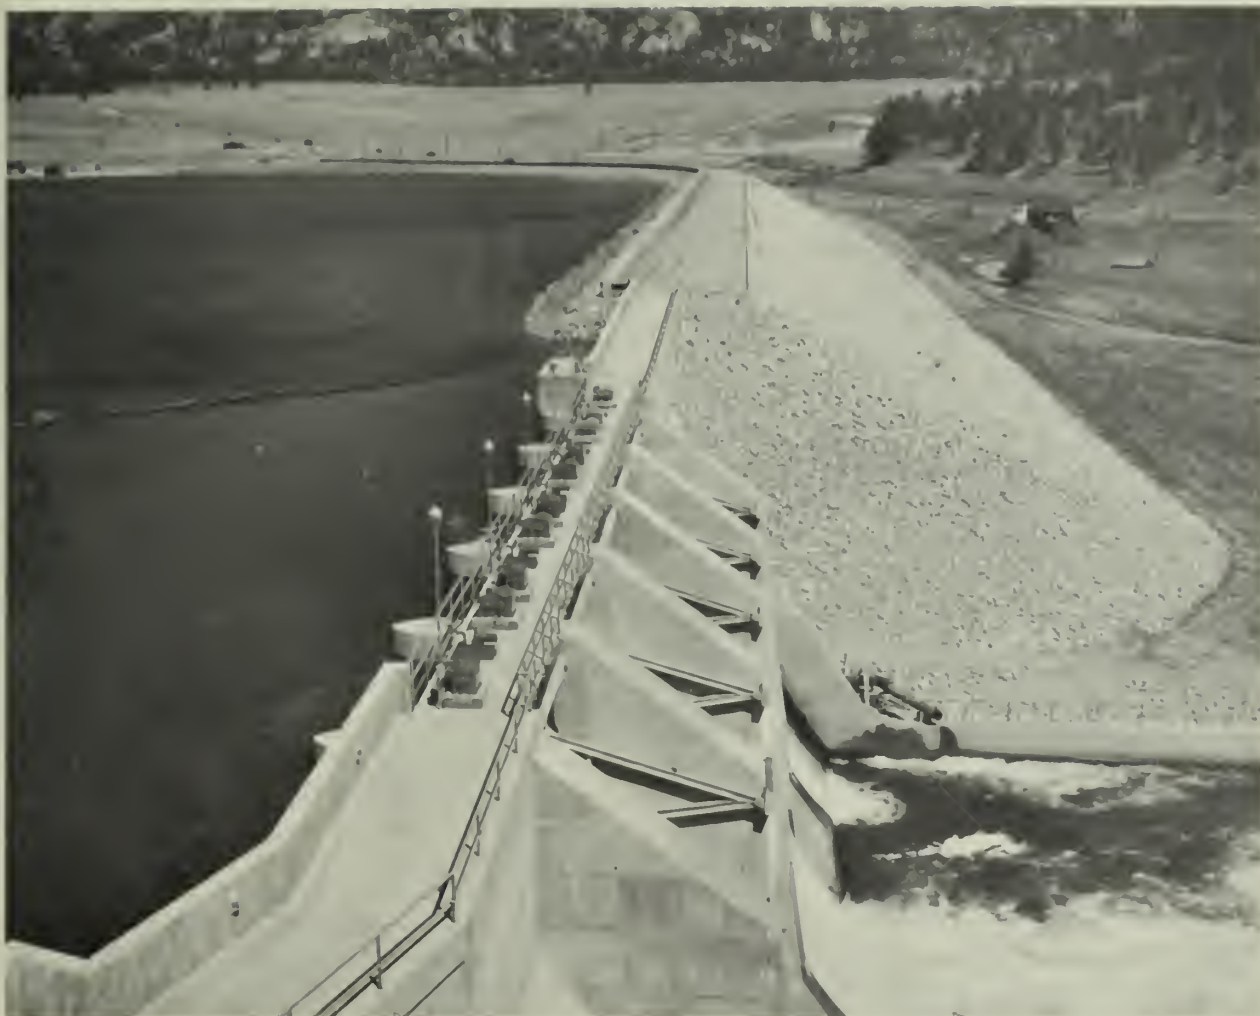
Olympus Dam, a combination earthfill and concrete-gravity structure on the Big Thompson River in Colorado. The concrete section contains the spillway and an outlet works to a canal. 245-704-3117.
